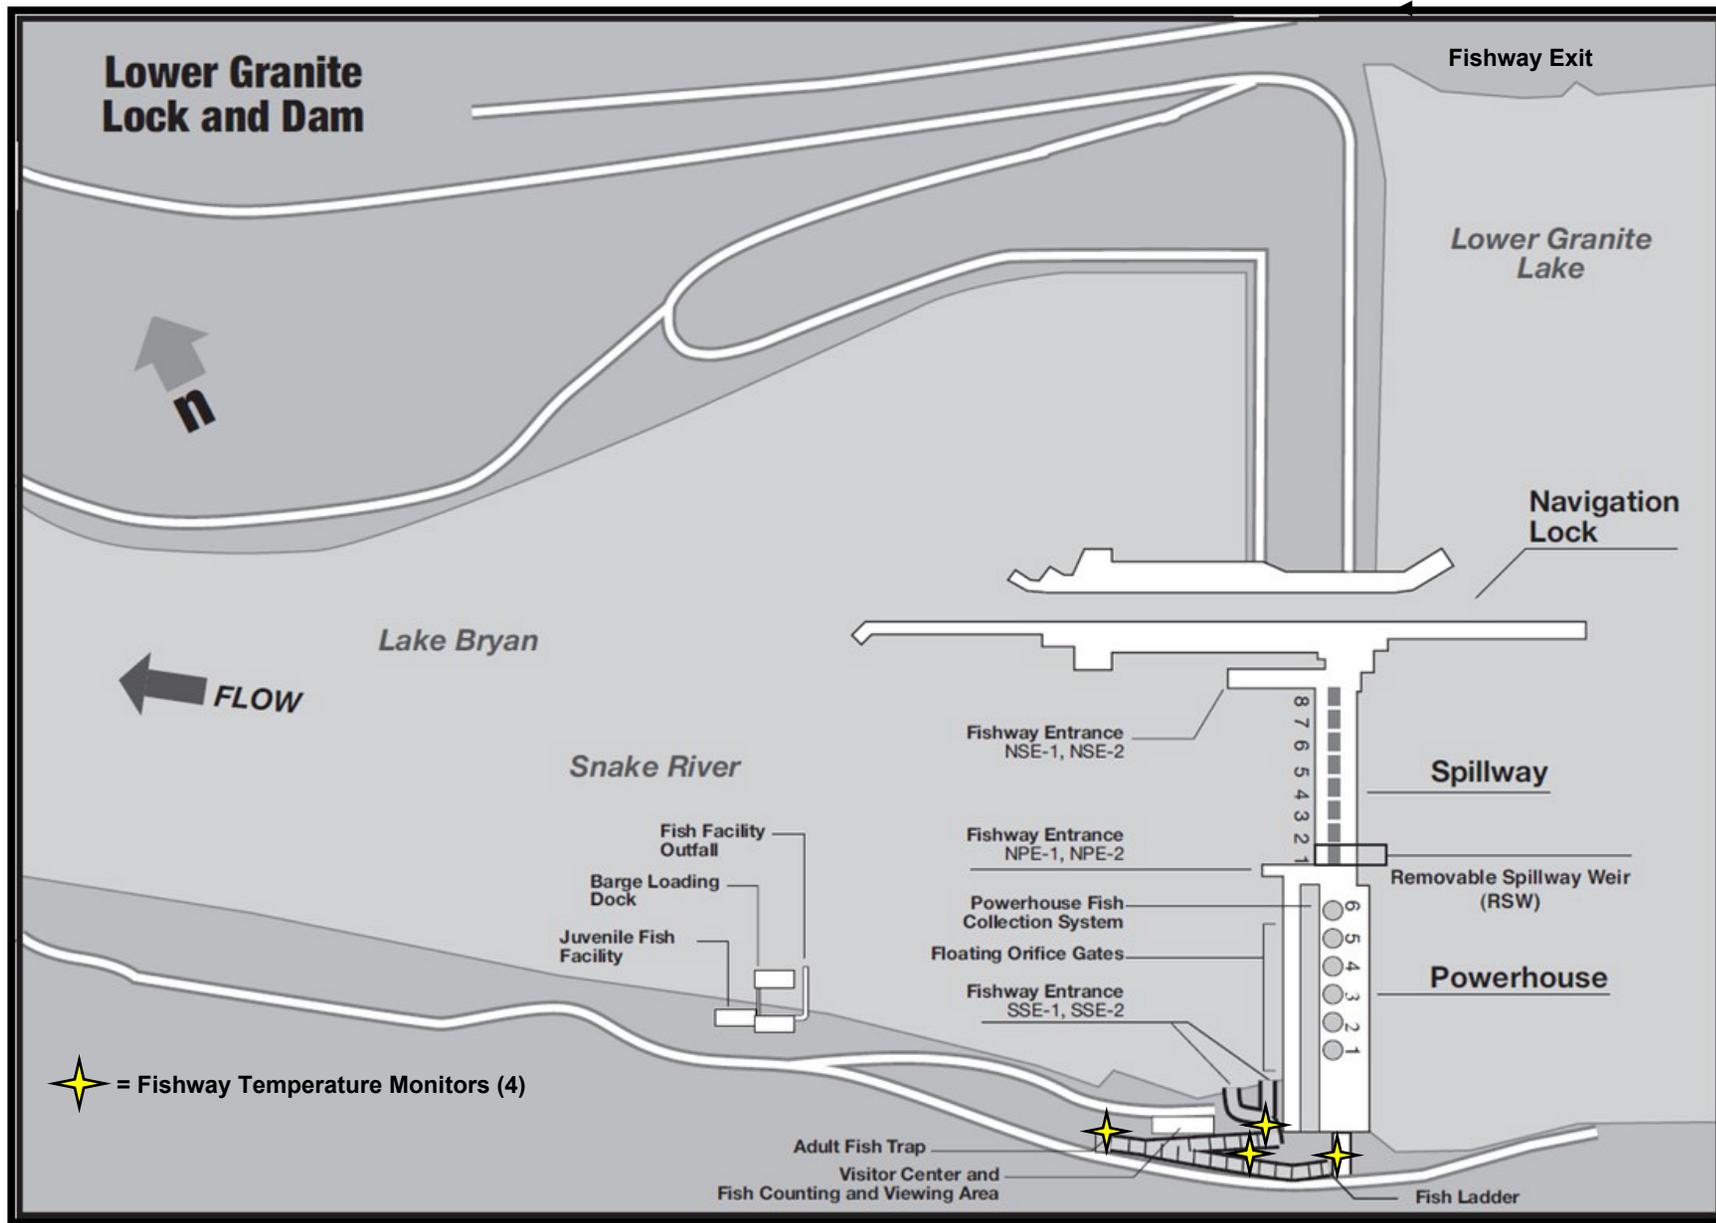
Lower Granite Lock & Dam General Site Plan.
